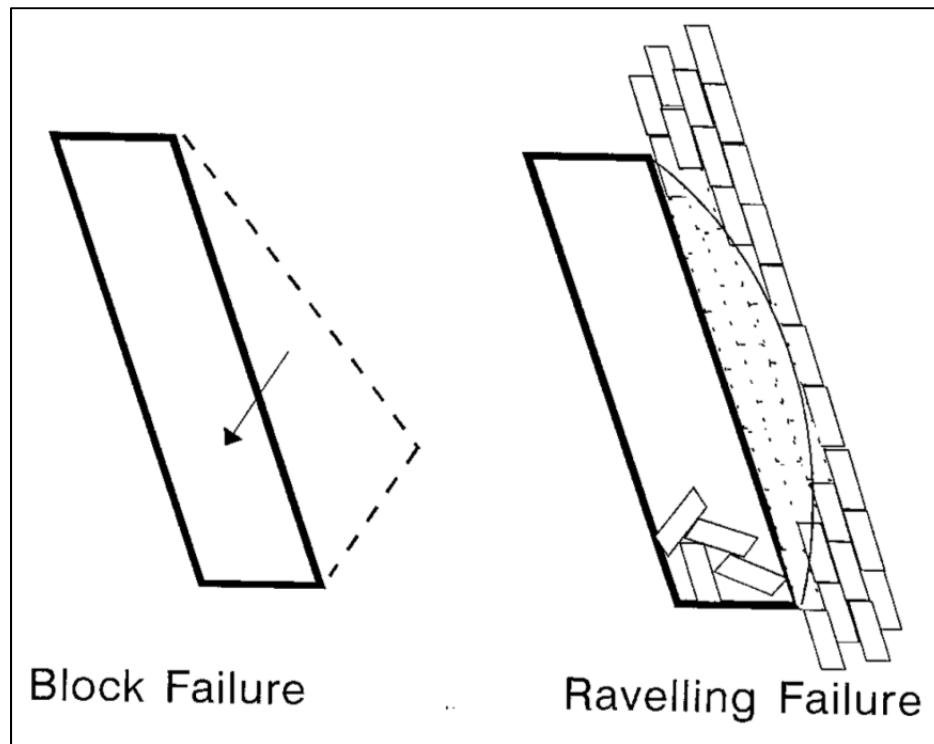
Examples of a hanging wall block failure and ravelling failure (From Milne, 1997).
